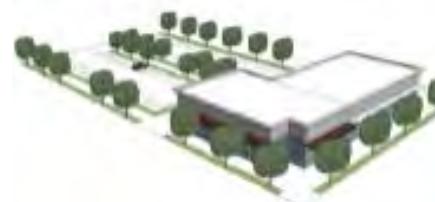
Multi-Story Mixed-use Office Over Street-Oriented Retail Building
